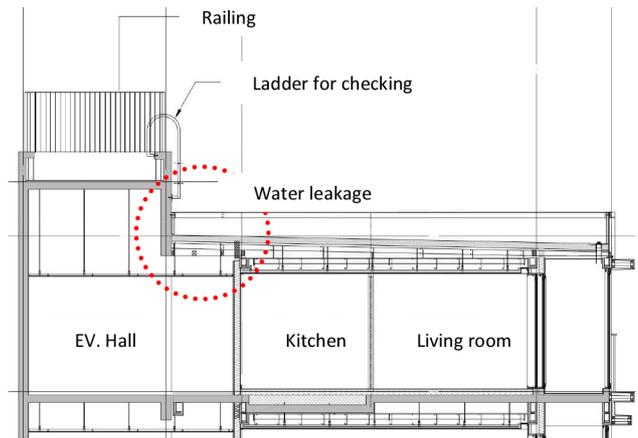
Water leakage due to exposed waterproofing in a modular public rental apartment house
